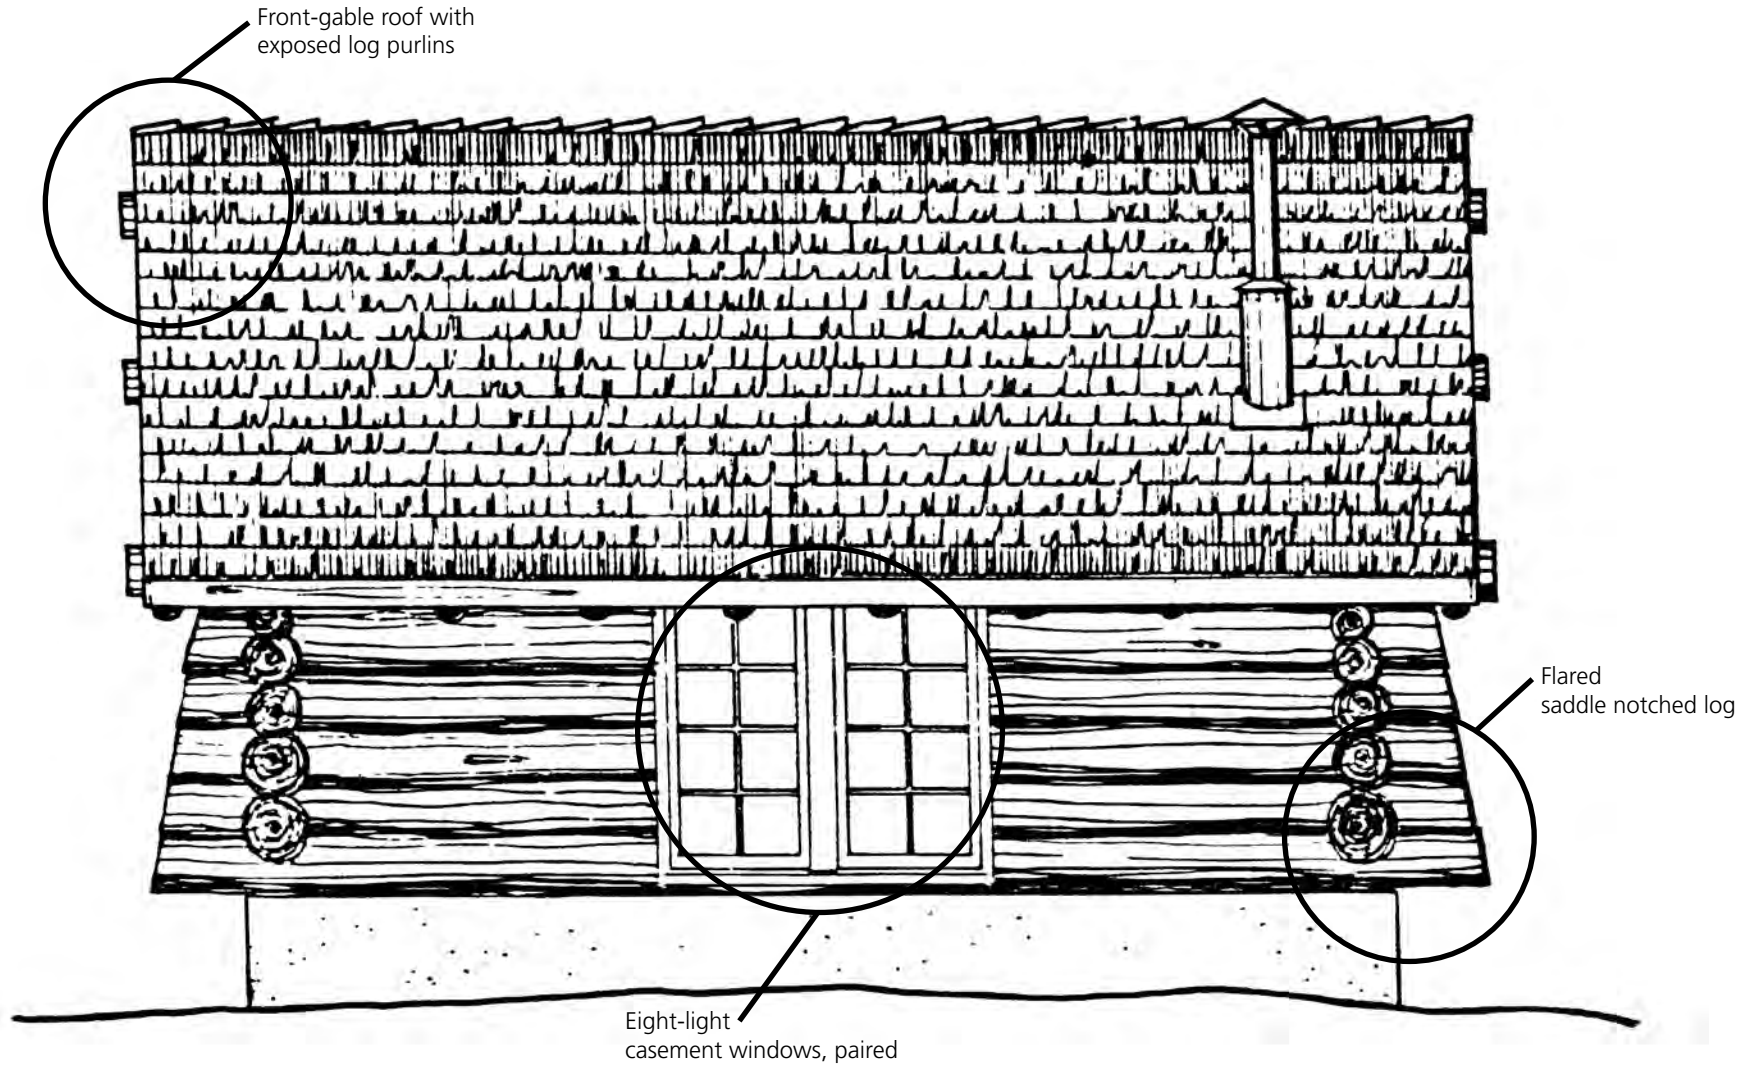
Building 110, North Elevation, Historic American Building Survey, National Park Service, W. Vandeventer and Dave Snow, 1986 (NPS Alaska Regional Office Files)
